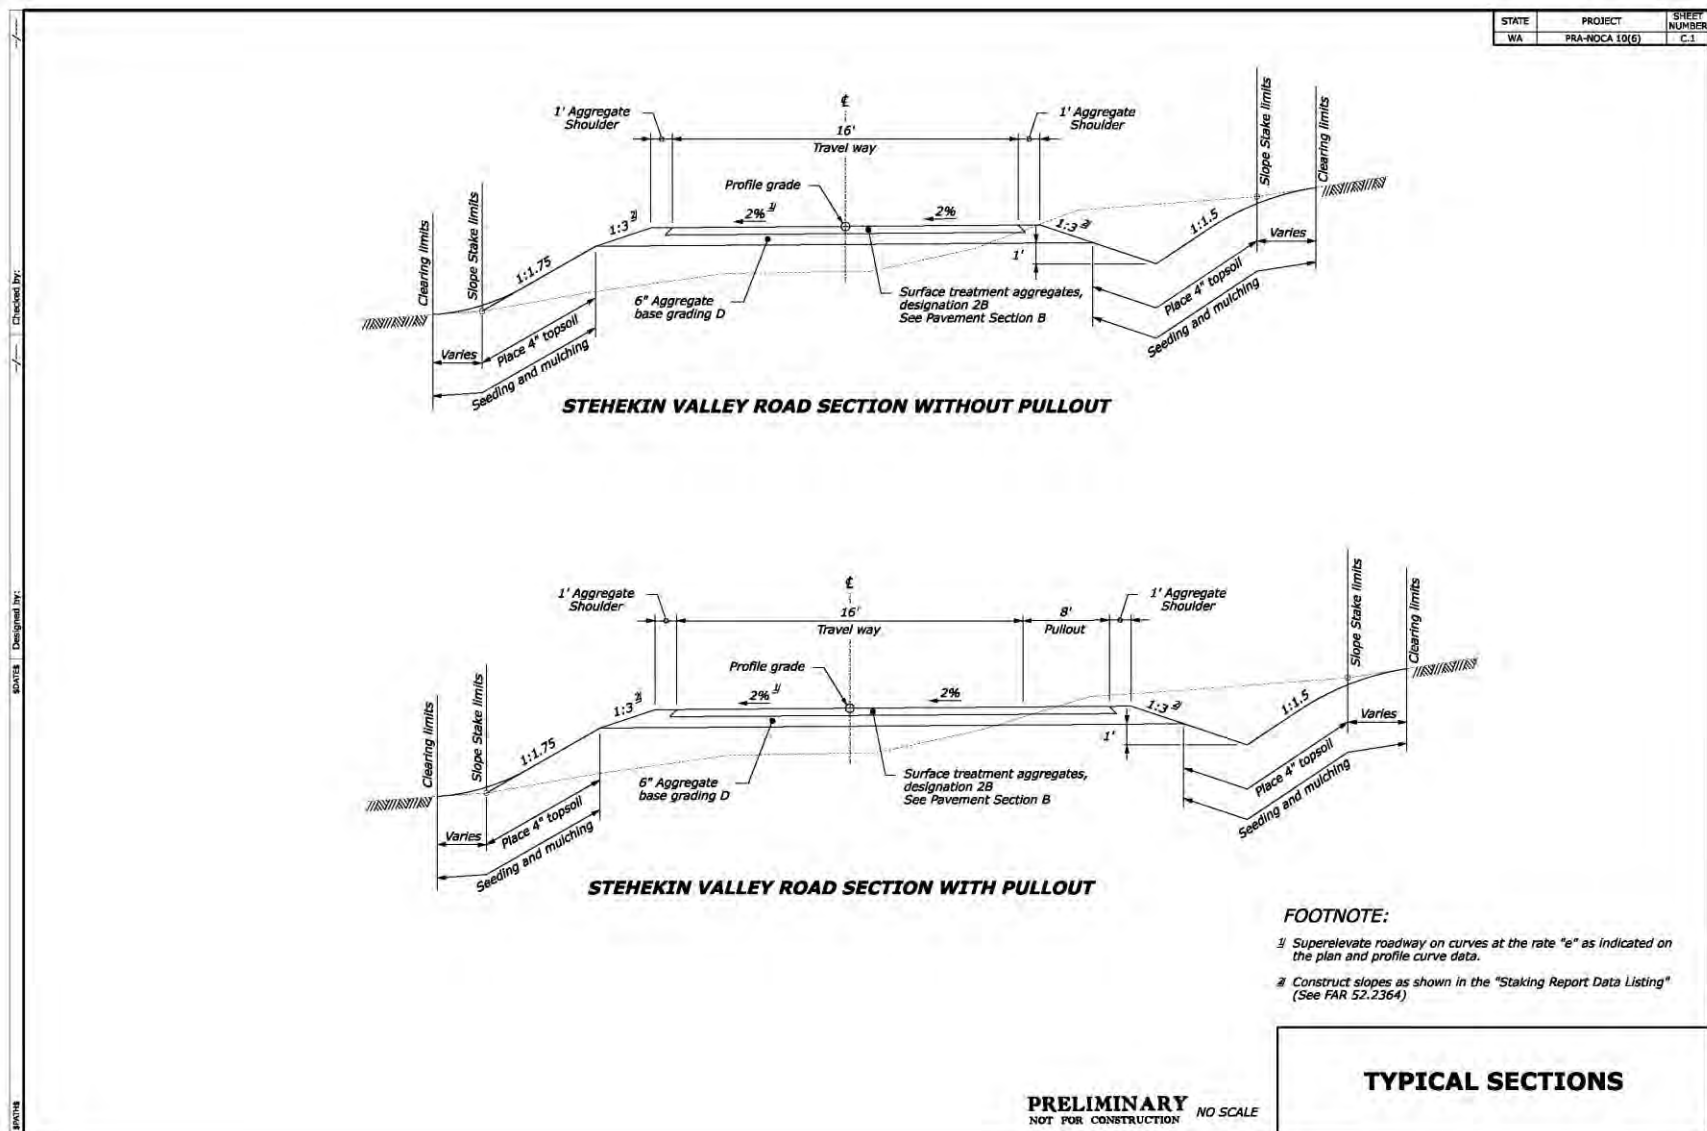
Typical Road Cross Section and Cross Section with Pullout
